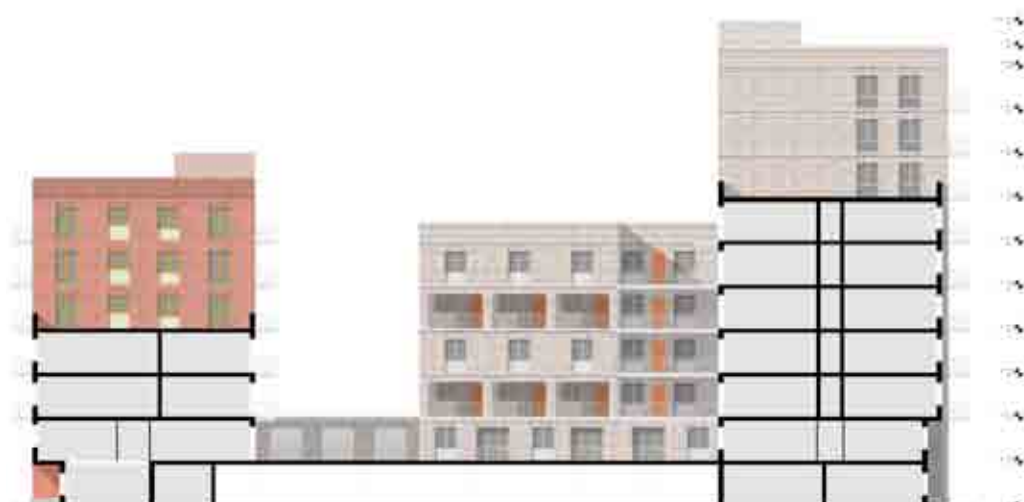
Block 4 East Elevation (Courtyard) Planning Submission October 2014
